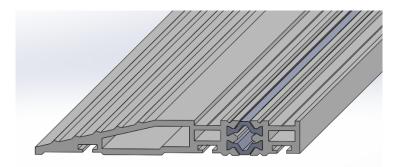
Cross-sectional view of the bottom threshold, with the broken cold-bridge shown in blue.
